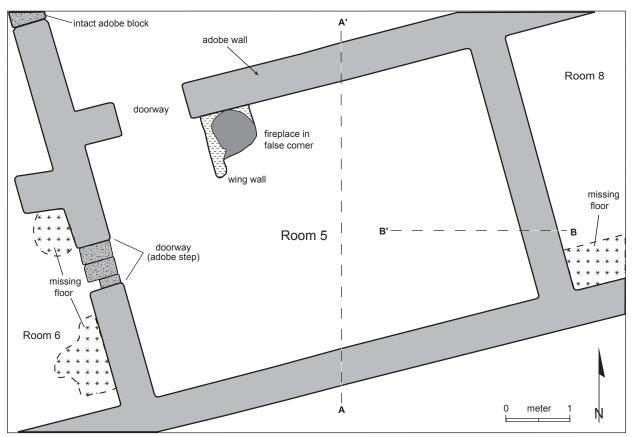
Plan of Room 5, Structure 1 at the Trujillo House.
